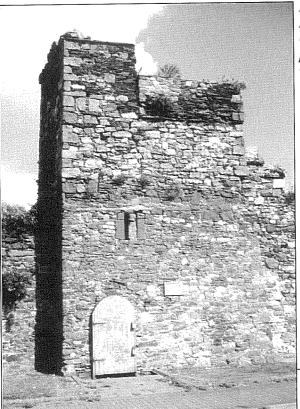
Southwest exterior of the Double Tower, fronting onto Castle Street outside of city wall, prior to commencement of conservation works in May 2003.
